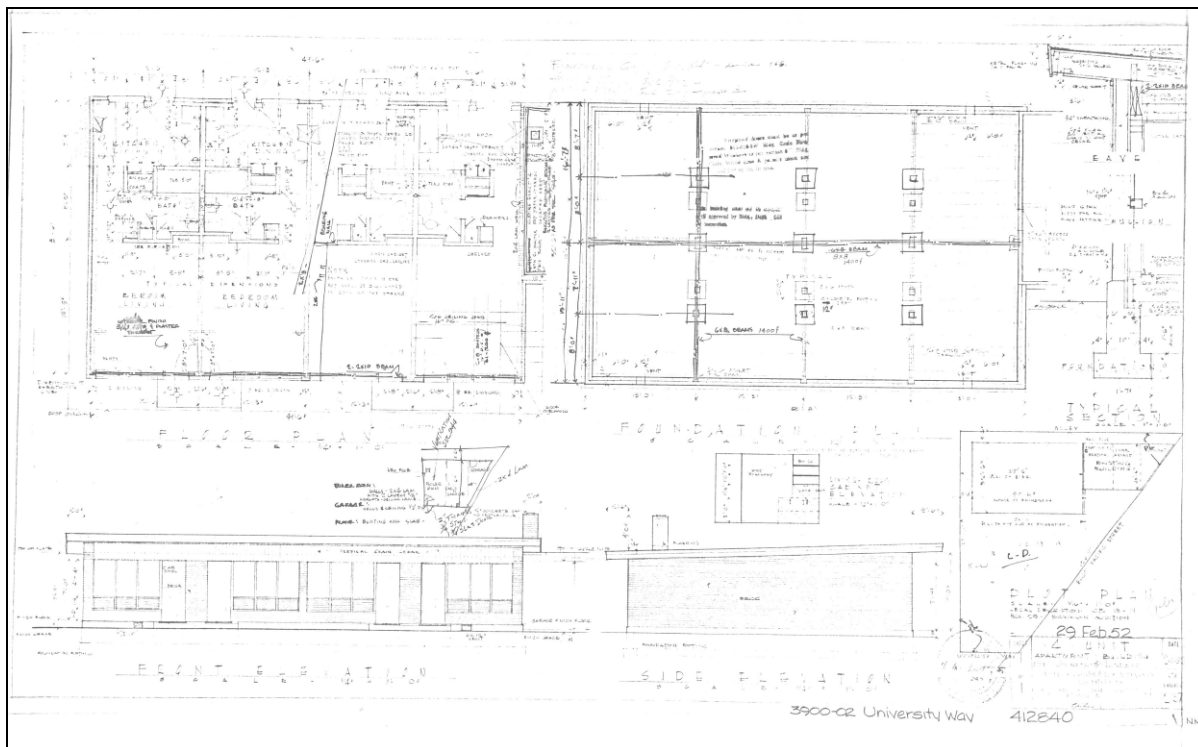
The single original drawing on file includes a plot plan, foundation plan, floor plan, front elevation, side elevation, and typical section. (University of Washington Facilities Records)
